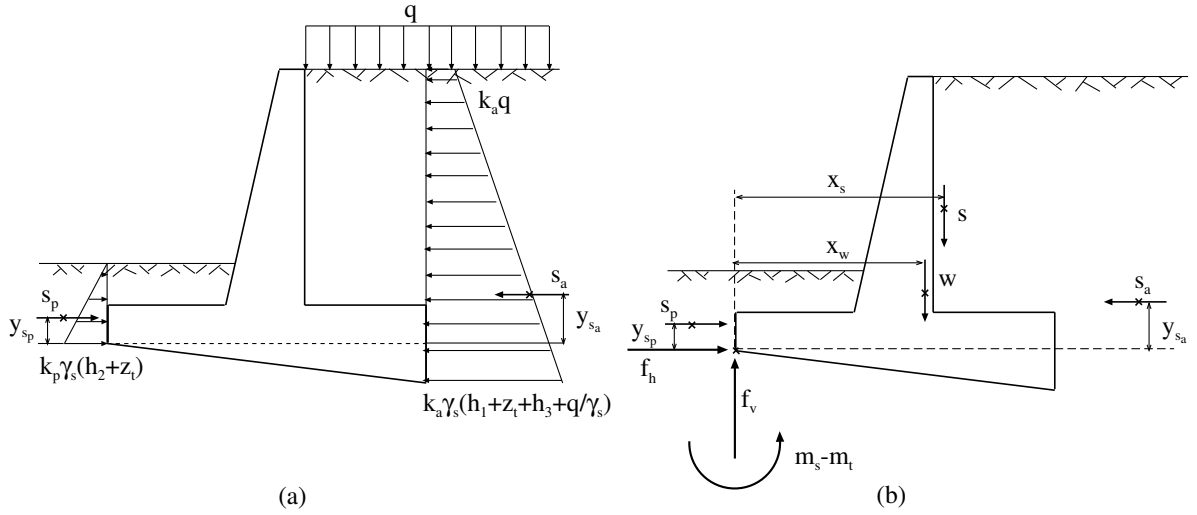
(a) Illustration of the earth pressures on both sides of the wall. (b) Weight and soil pressure forces acting on the wall.
